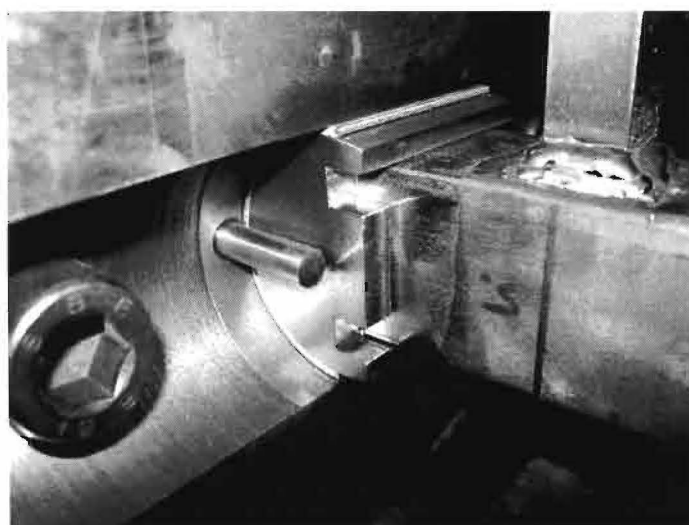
Bearing block in test setup. The end of the steel column of the test specimen perfectly fits in the notched shaft.
